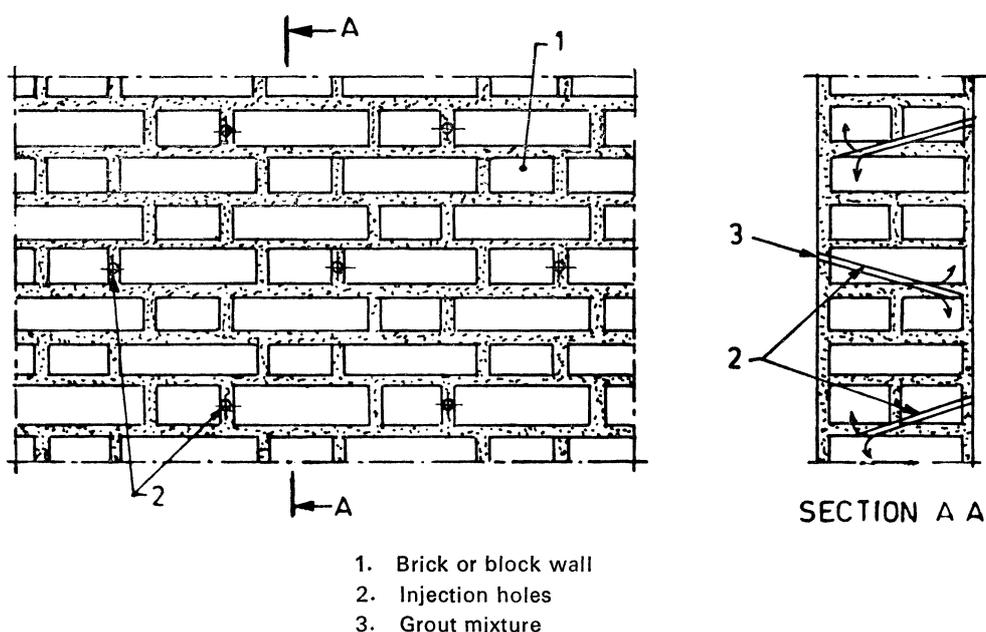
GROUT OR EPOXY INJECTION IN EXISTING WEAK WALLS
